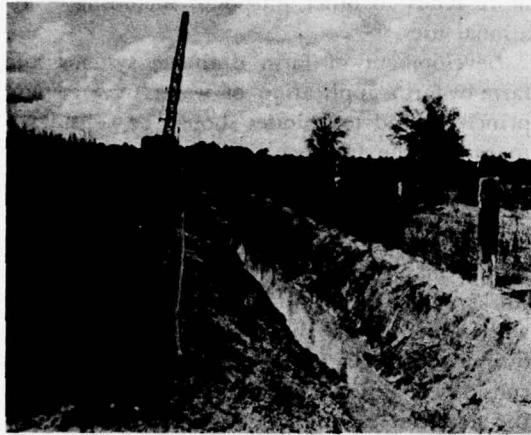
Drainage Project, Under Construction, Will Provide Control of Ground Water Levels.
